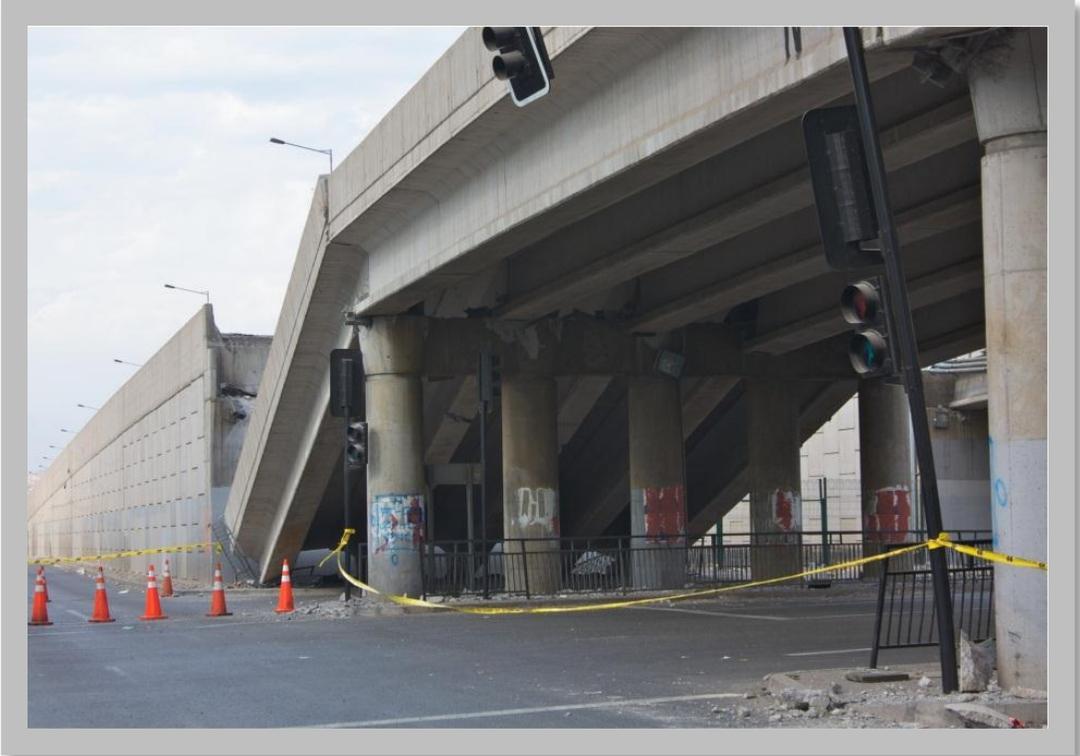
Restrainer cables will prevent bridge superstructure fall-off. (Photo Source: Flickr.com)
